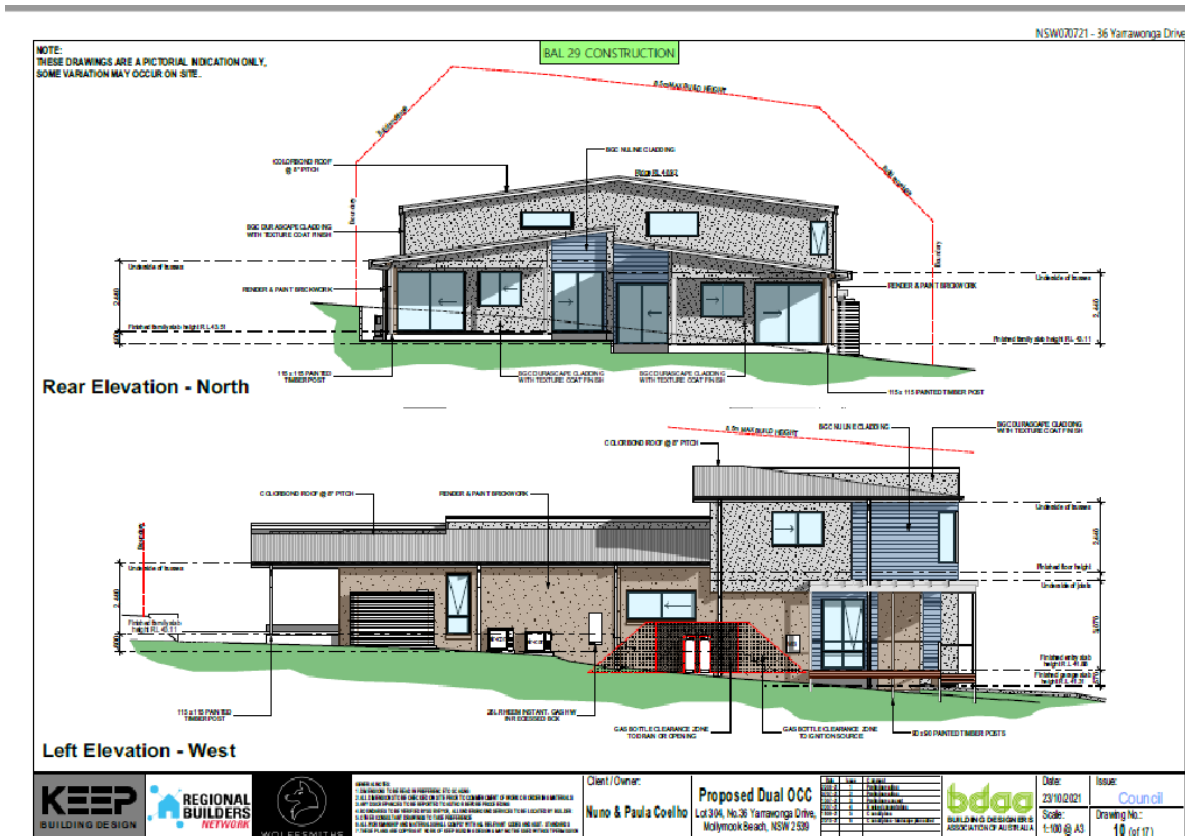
North & West Elevations - 36 Yarrowonga Dr, Mollmook Beach
